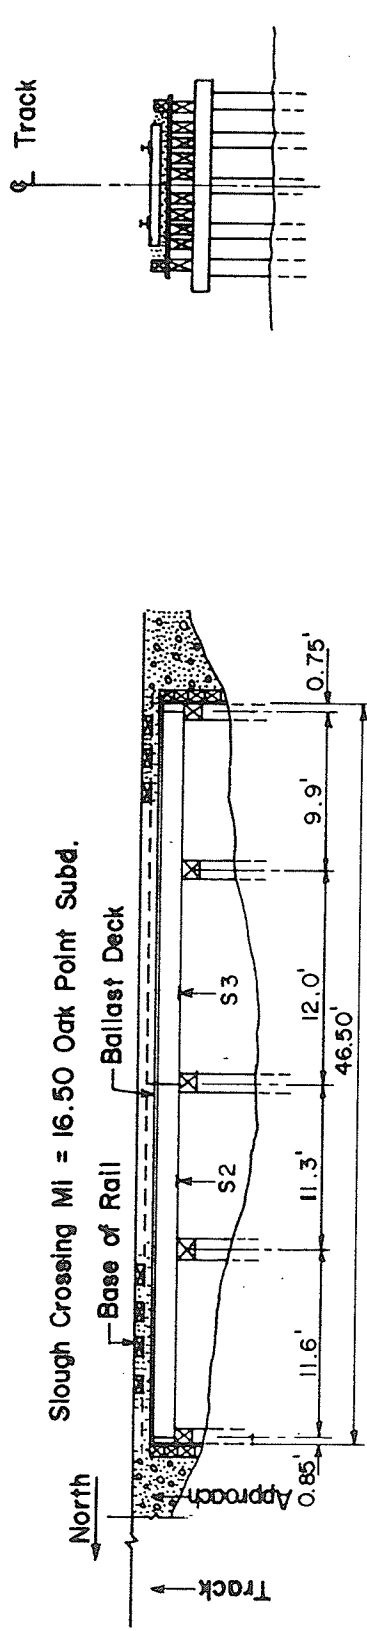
Elevation and typical cross-section of the ballast-deck bridge
